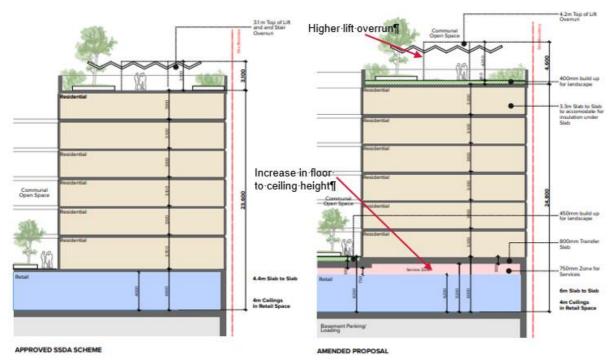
| Section of Site 1B showing increase in ground floor ceiling heights and lift overrun (Base source: EIS)
